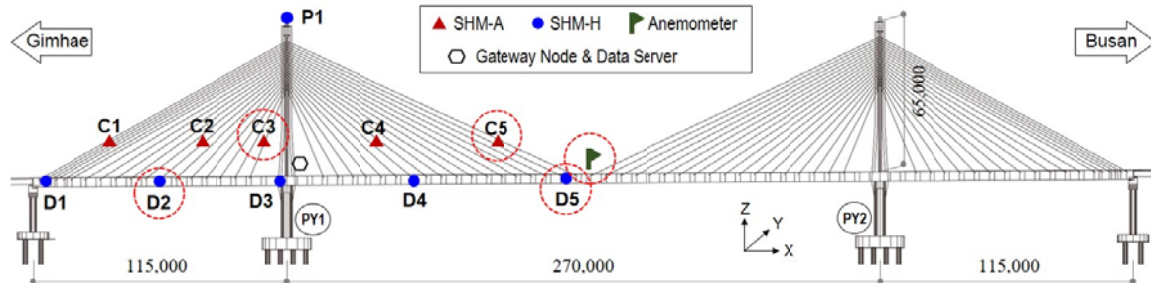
Sensor layout on Hwamyung cable-stayed bridge
